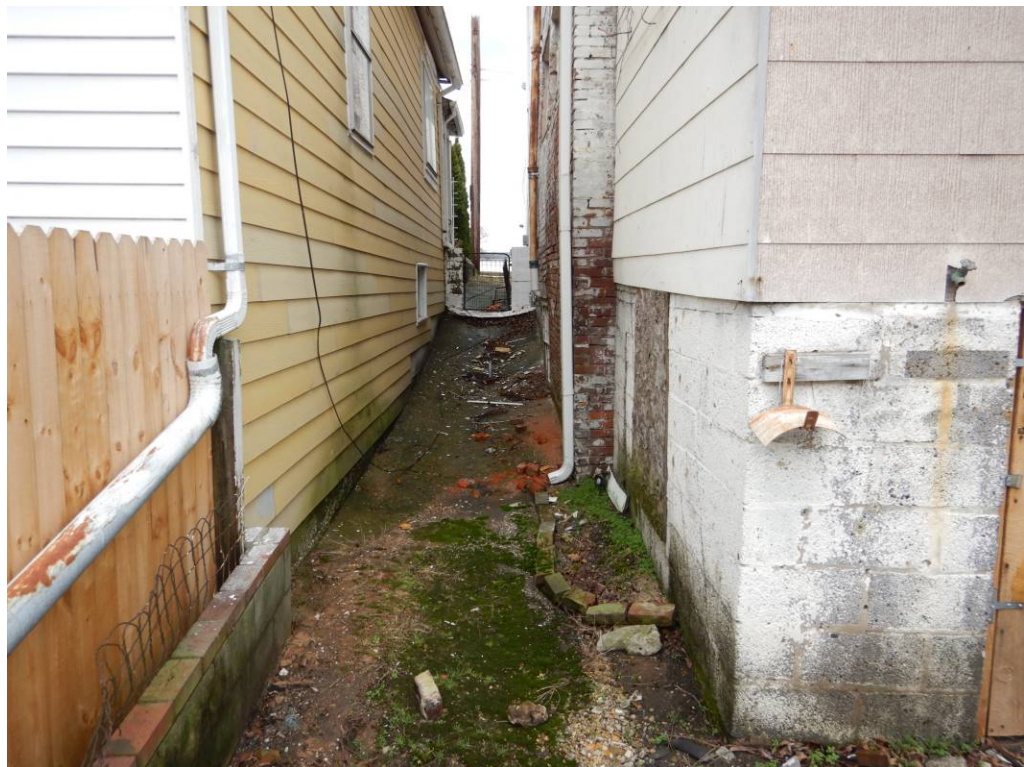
Looking northward into the space between the subject building and the residence to the west.
